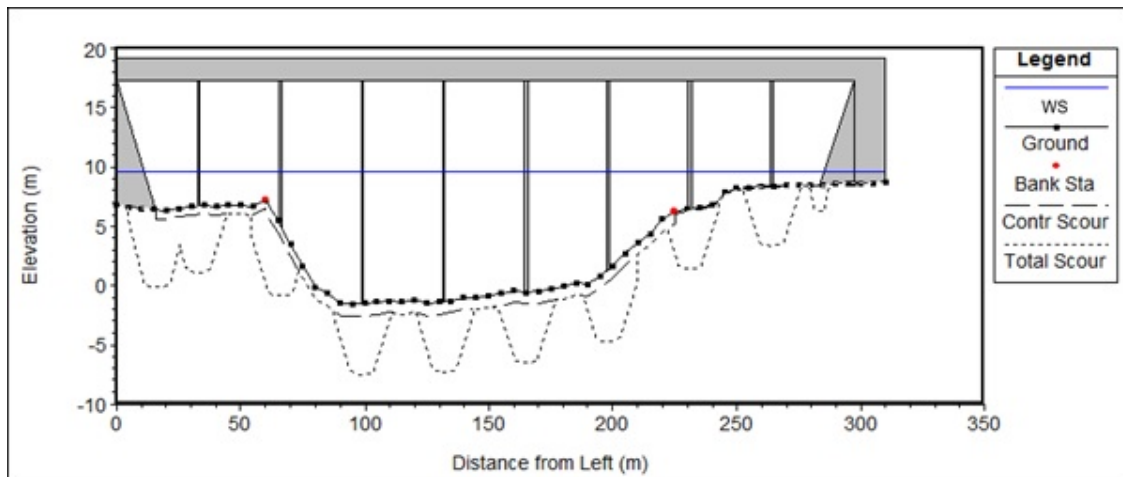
Variation of pier scour at the Manikganj Sadar Bridge under design discharge condition with the HEC-RAS model [the maximum local scour is found to be 4.95 m, with 1.0 m pier width]
